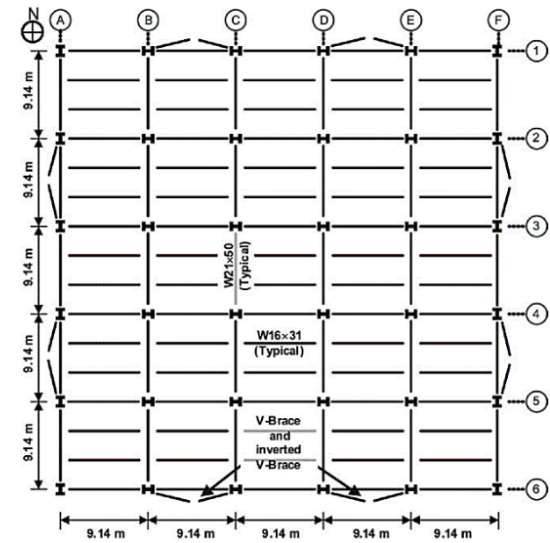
Plan layout for braced frame systems (Ghosh 2006)
